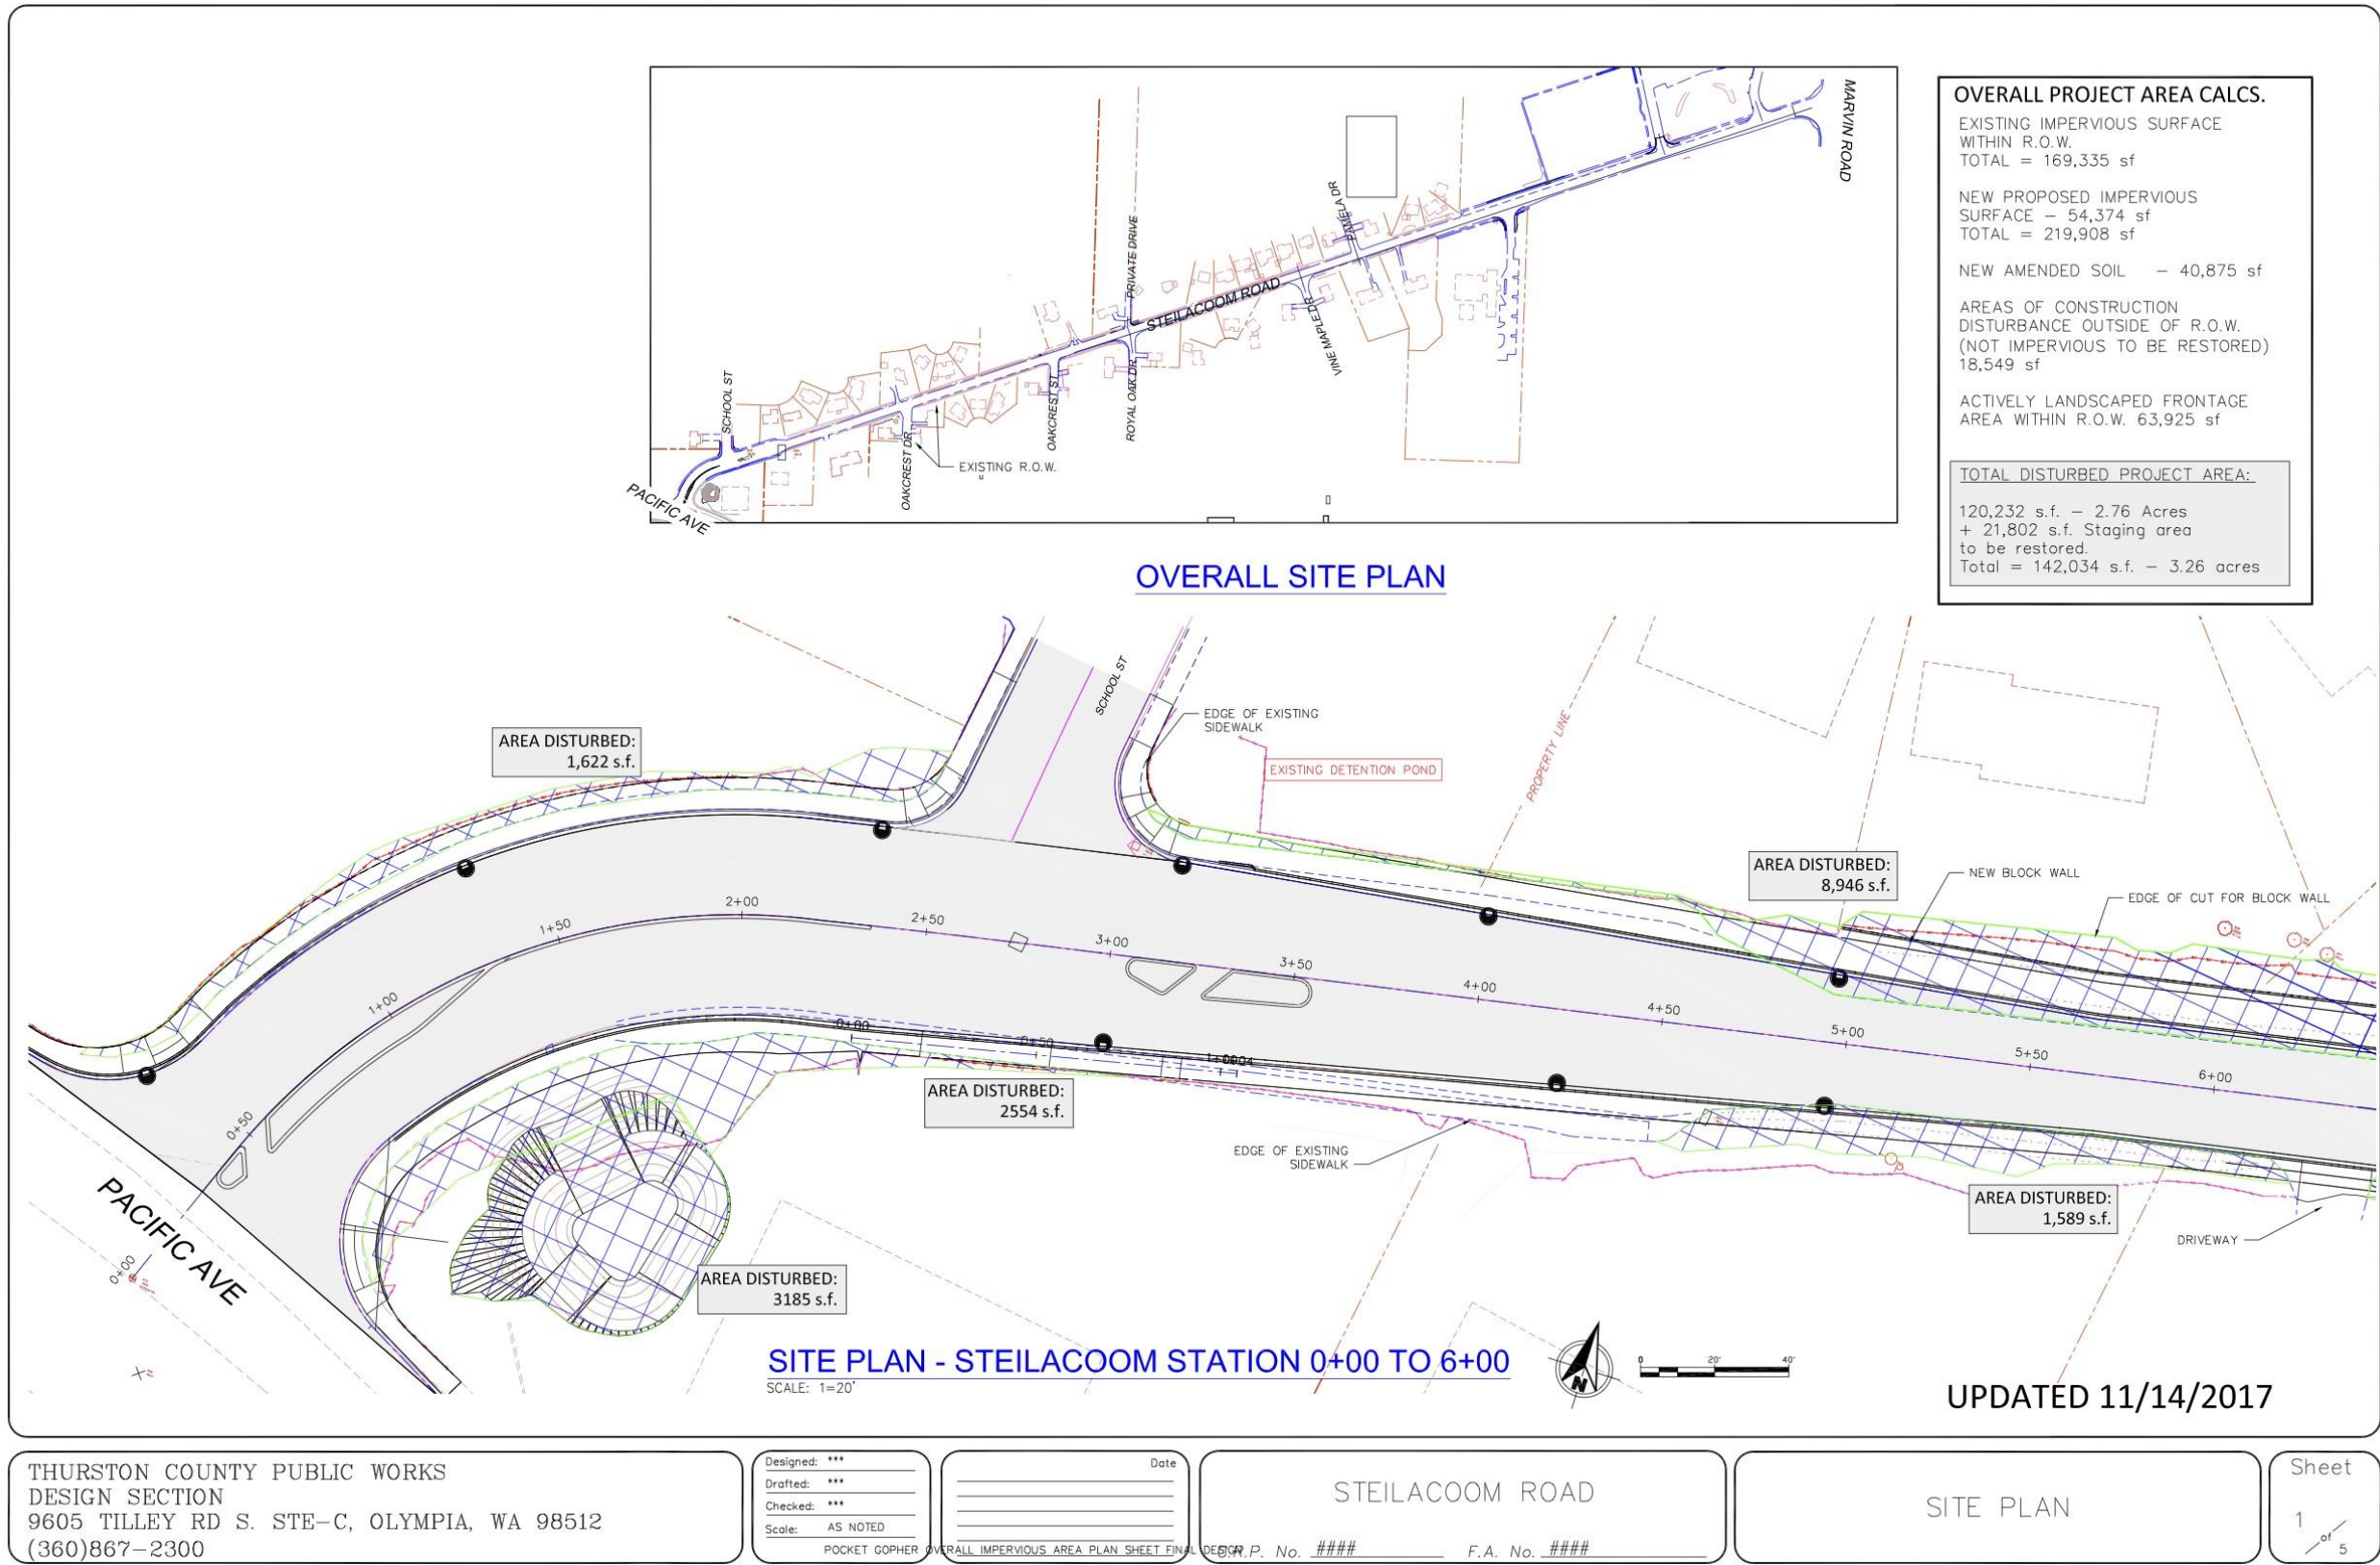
Steilacoom Road Site Plan Drawing – Sheet 1 of 5
